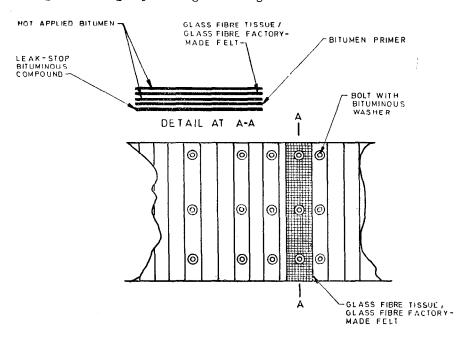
Special Treatment for AC/GI Corrugated Surface Joints—Typical Details
